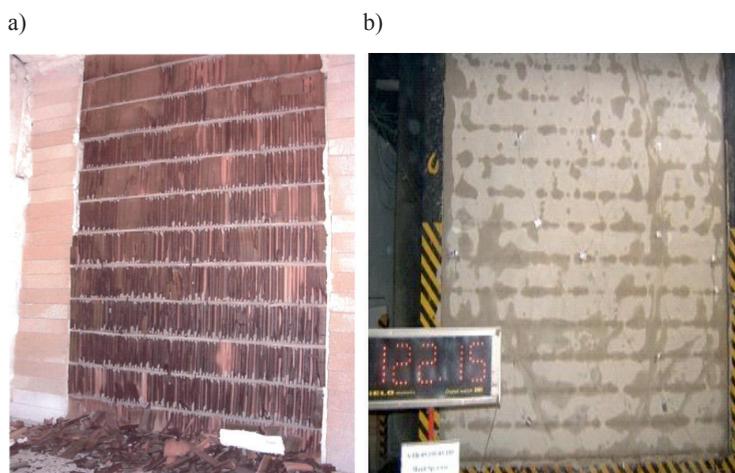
Examples of typical phenomena occurring while carrying out fire tests: a) spalling from the wall side exposed to fire for ceramic masonry hollow units (Report from fire tests on walls made from THERMOPOR masonry hollowed units – LEIER, Poland), b) condensation zones along the joints and cracks for walls made of concrete blocks on non-heated surface (Report from fire tests on walls made from OPTIROC masonry units – MAXIT, Poland)
